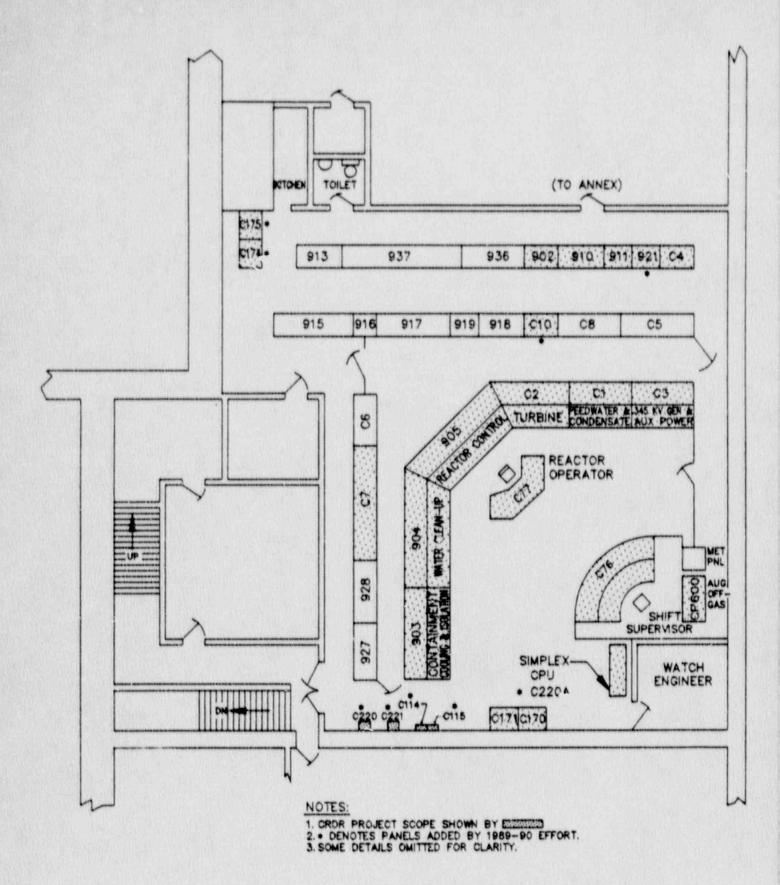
LAYOUT OF PILGRIM STATION CONTROL ROOM
